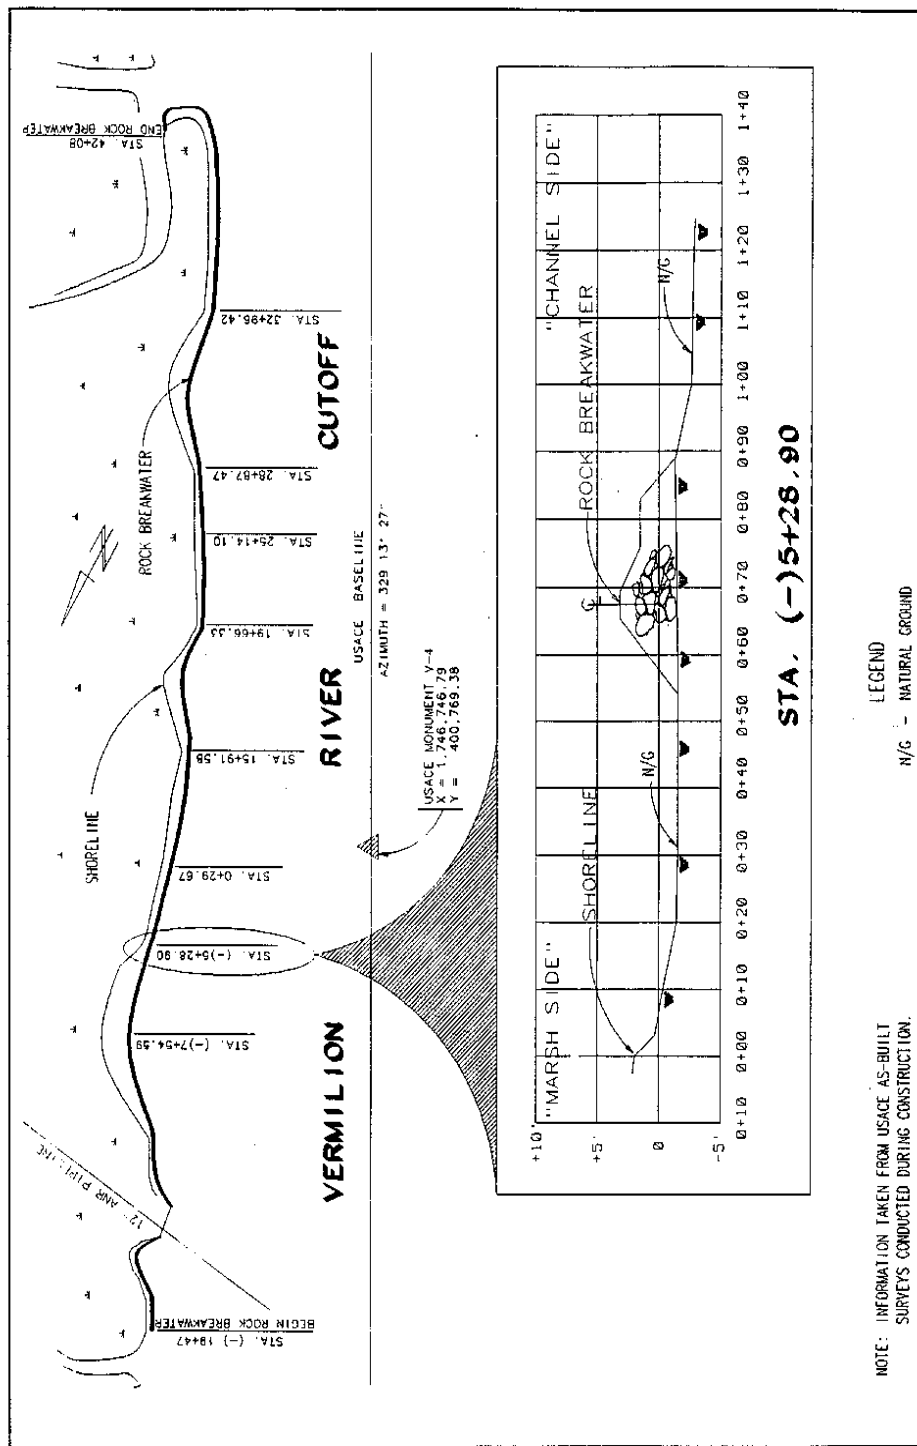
Plan and cross section showing station (-) 5+28.90 of elevational survey.
